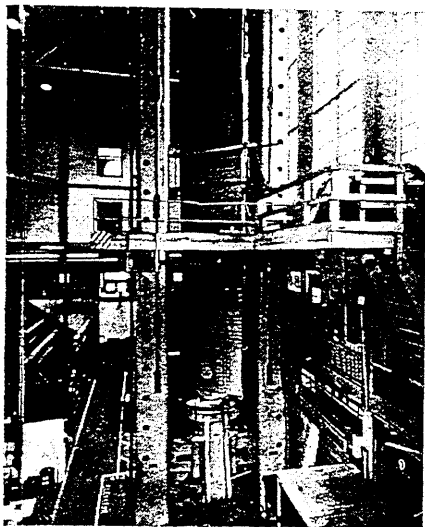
Six-foot wide specimen ready for test in 3,000,000-lb machine
